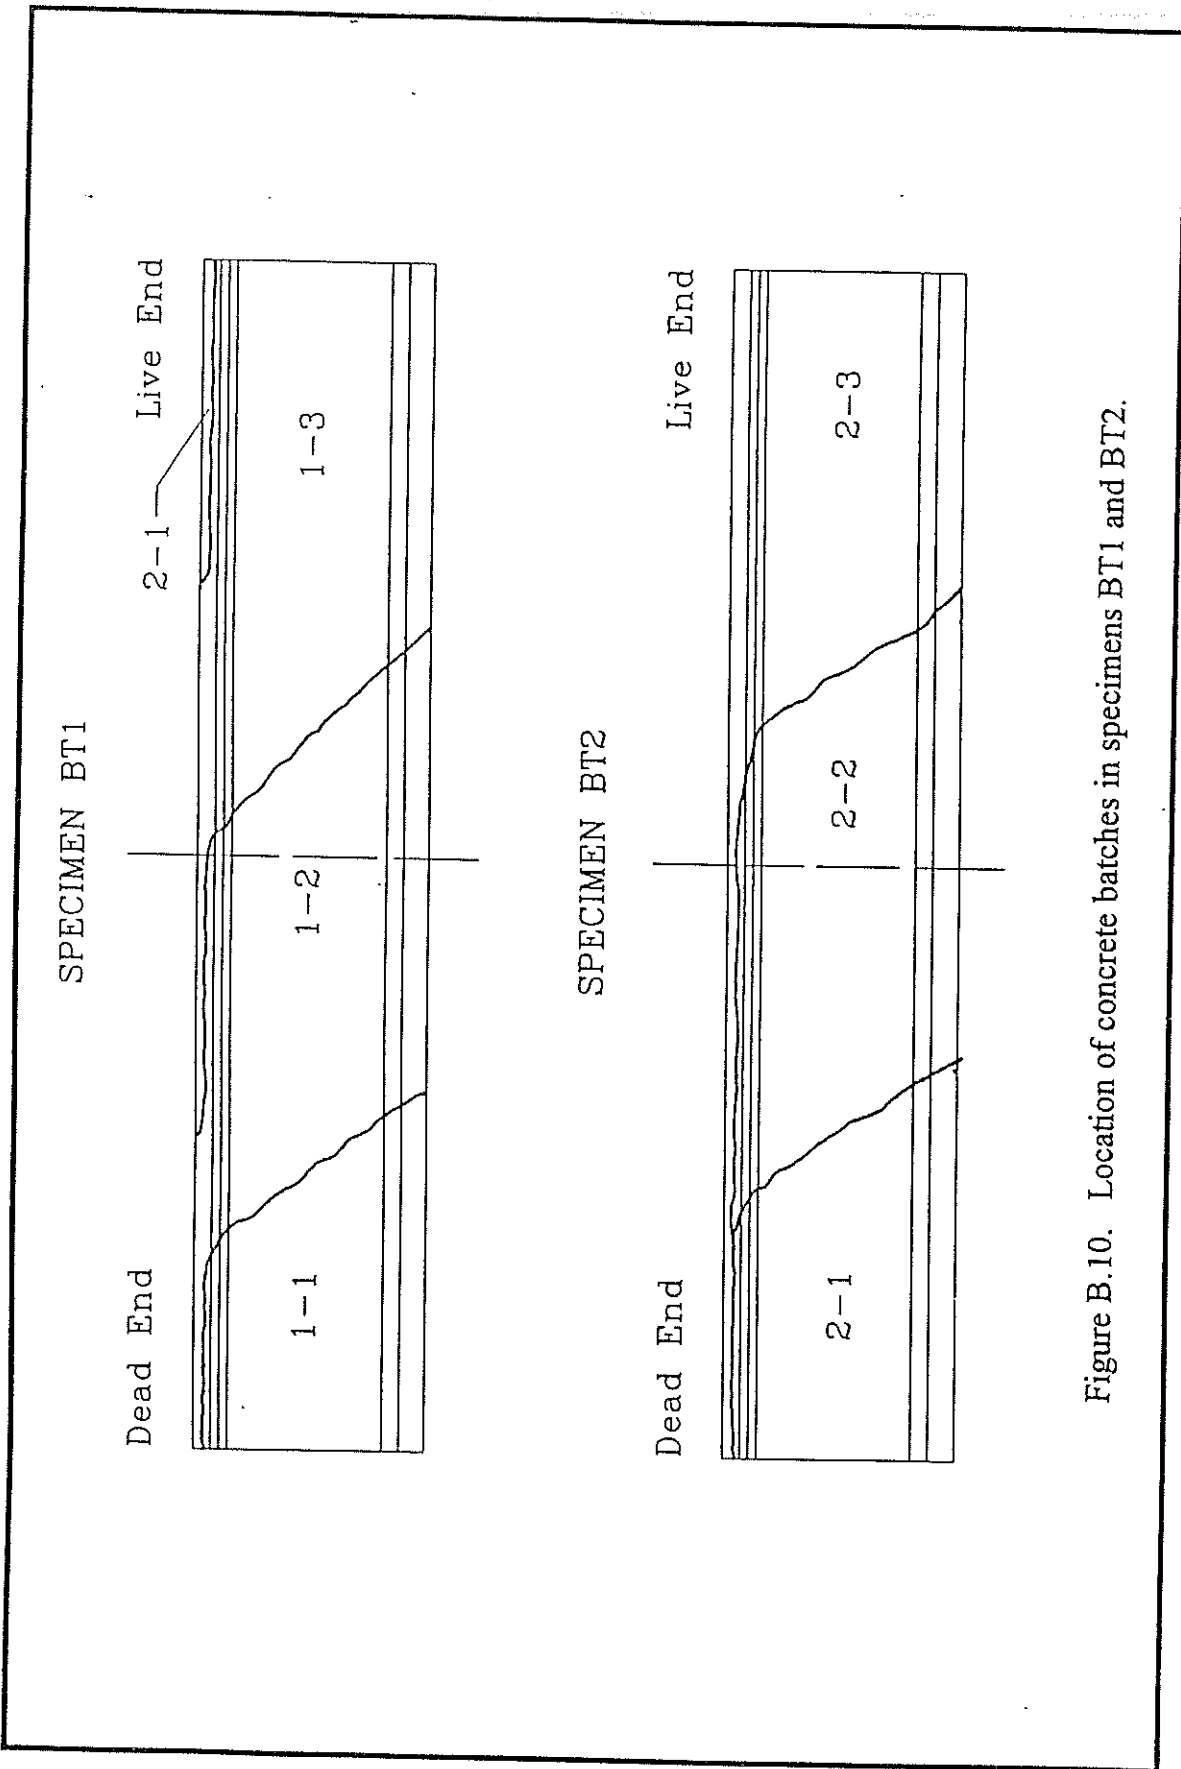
Location of concrete batches in specimens BT1 and BT2.
